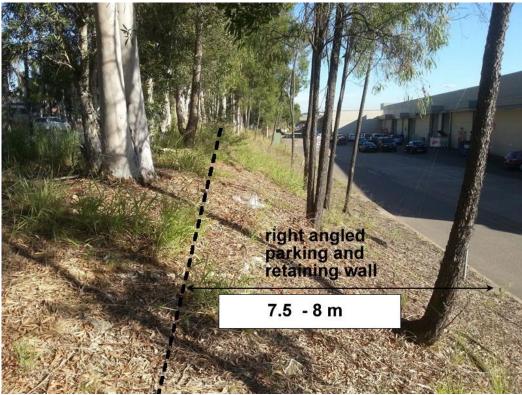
shows the zone where right angled parking is proposed. The trees on the left at the top of the slope may have excavation too close and the structural root zone is encroached.
